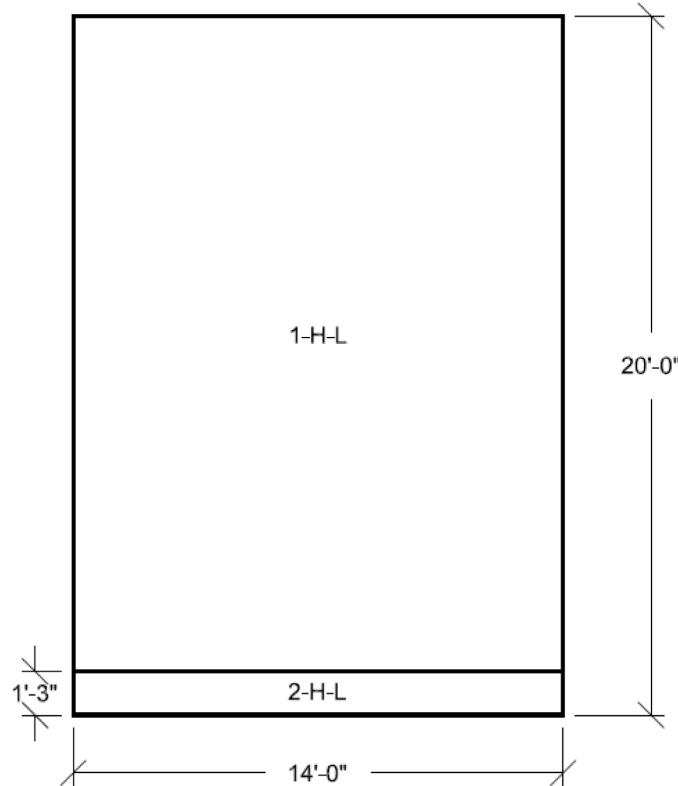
H.6-173 DGFOSV Wall 9 Looking From Outside Horizontal Reinforcement Zones Near Side Face
